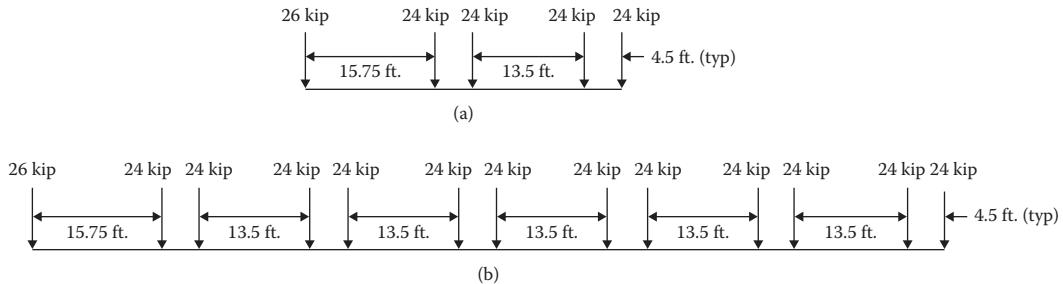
Permit trucks used in the rating examples: (a) 5-Axle routine permit truck configuration (P5 truck), (b) 13 Axle single permit truck configuration (P13 truck).
